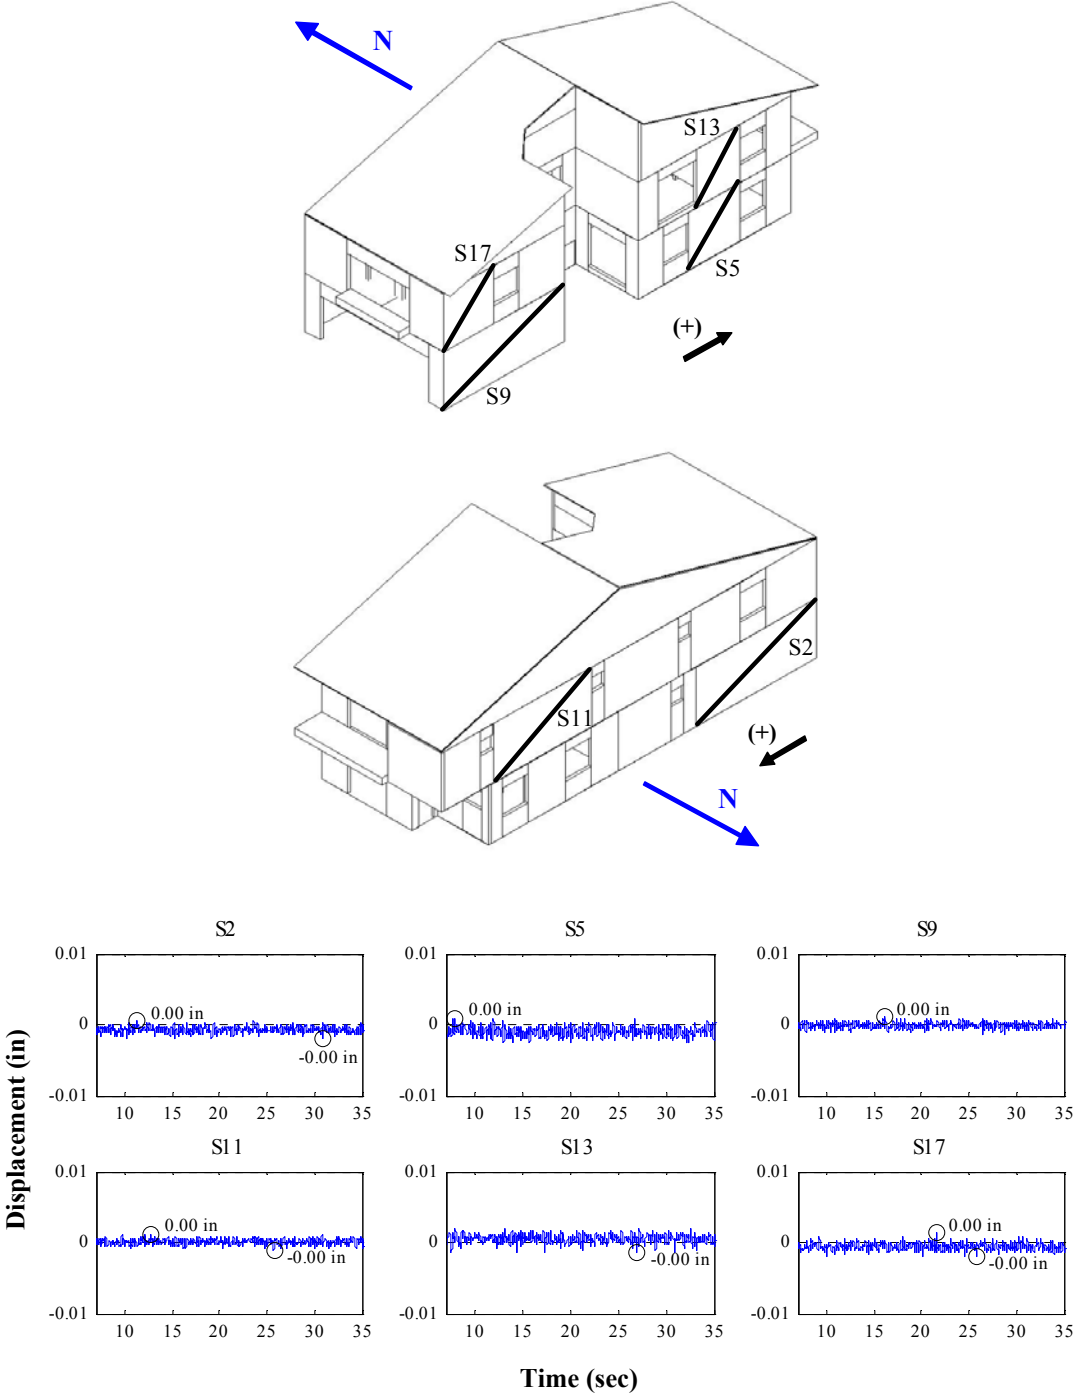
Wall deformations of east-west external walls for Test NWP3S02
